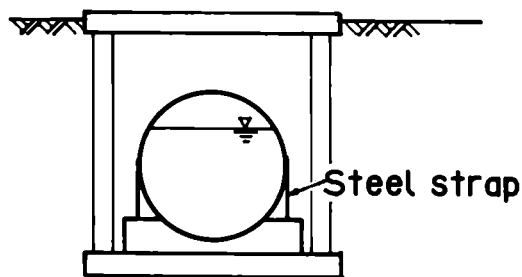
Typical Cross-Section of Underground Fuel Tank
